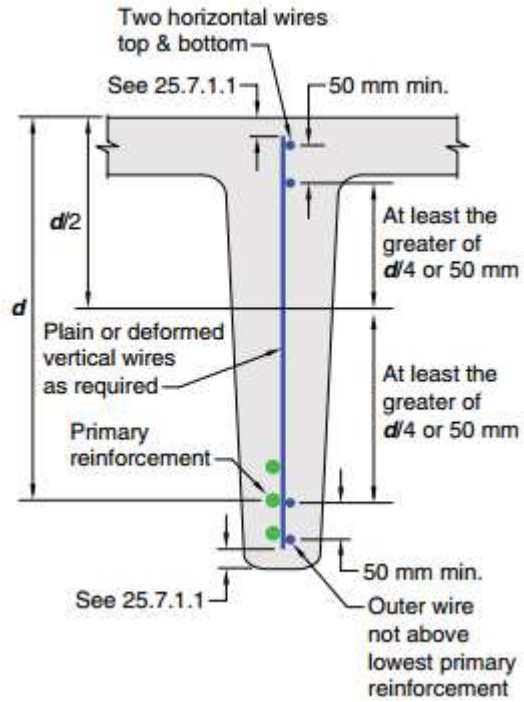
Anchorage of single-leg welded wire reinforcement for shear.
